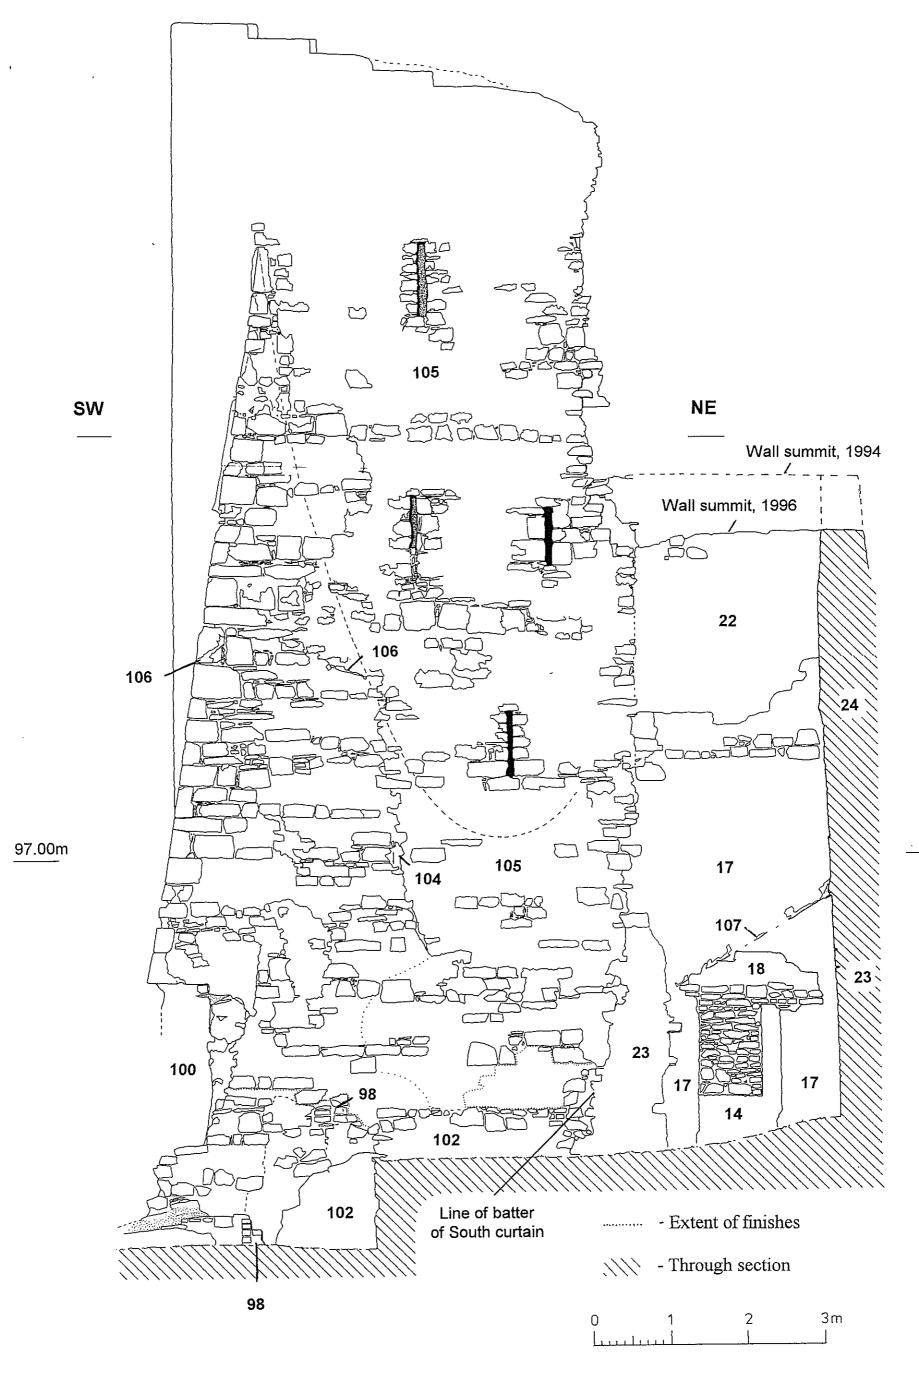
Carmarthen Castle SW Tower: South-east external elevation
